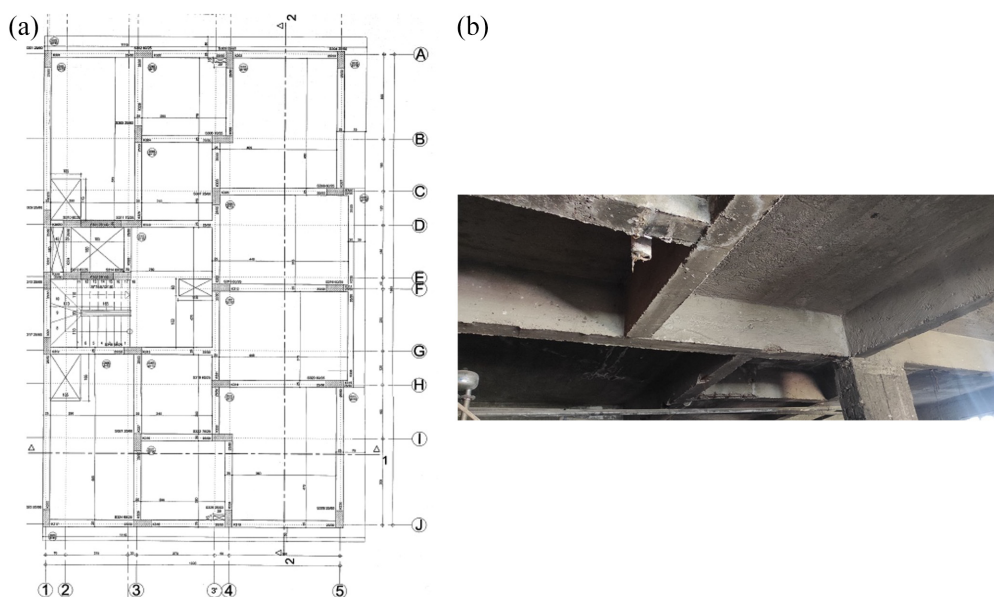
Irregular framing examples: (a) floor plan and (b) floor soffit.
